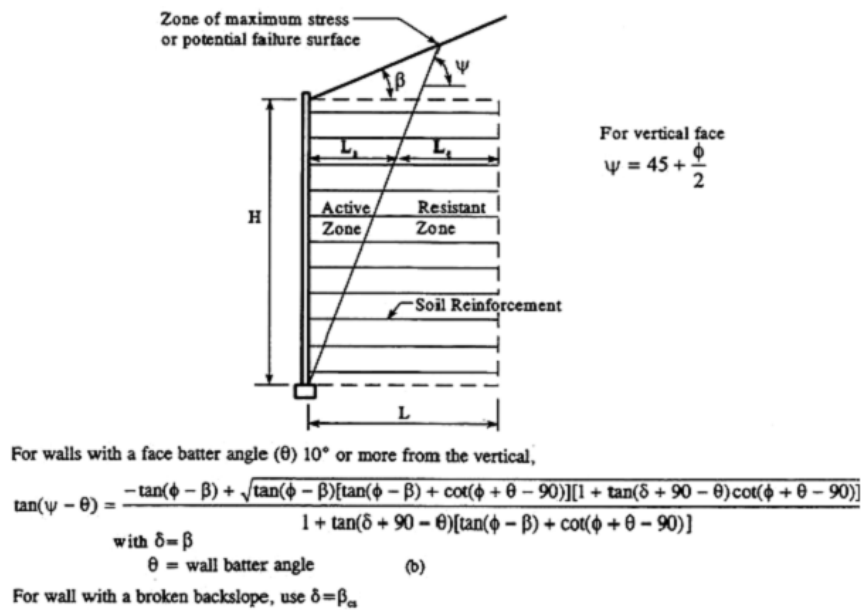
Location of Assumed Failure Surface for Extensible Reinforcement (FHWA, 2009).
